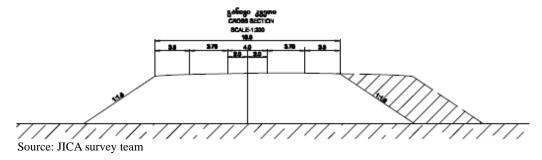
Plan 1: Temporary 2 Lane Road with Median
